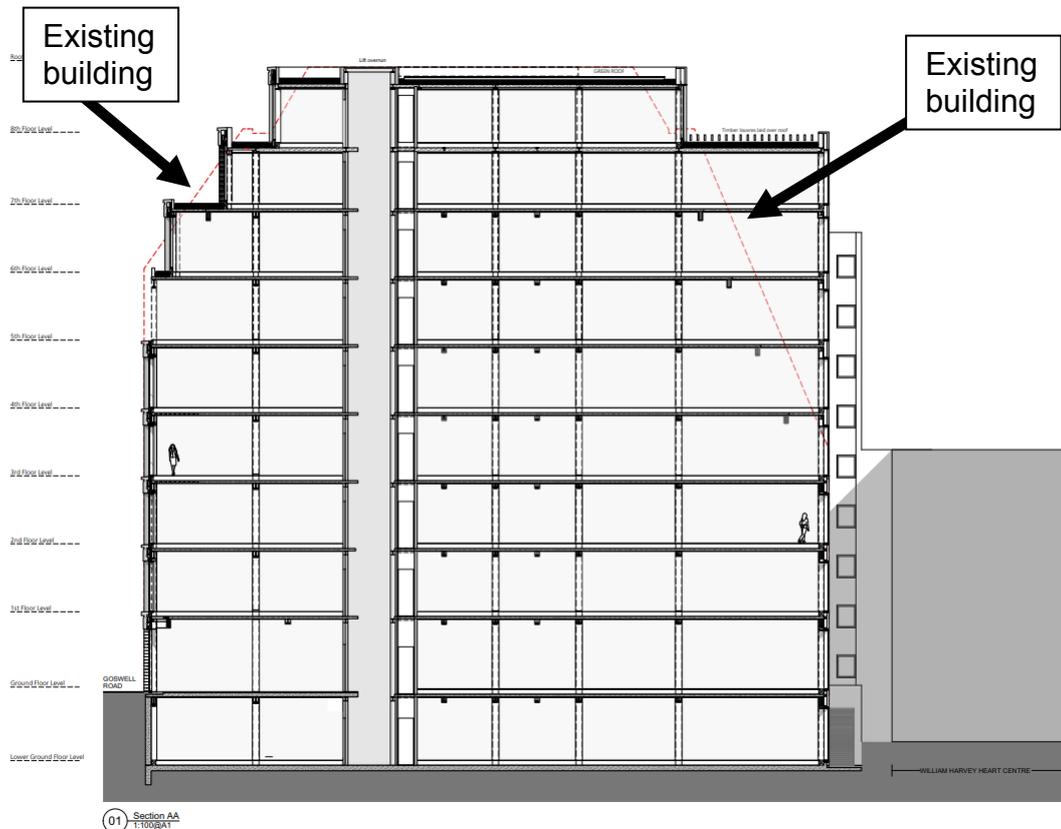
Proposed section (A-A) drawing through the host building with arrows identifying red dotted line with shape of existing building
